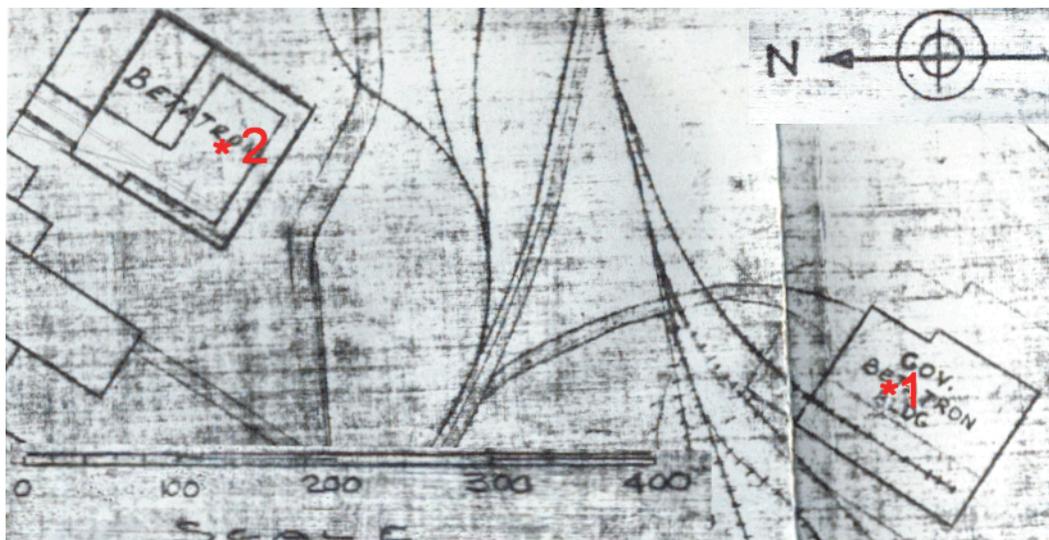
Detail from Plant Layout, Showing Betatron Buildings (GSCC 1969)
